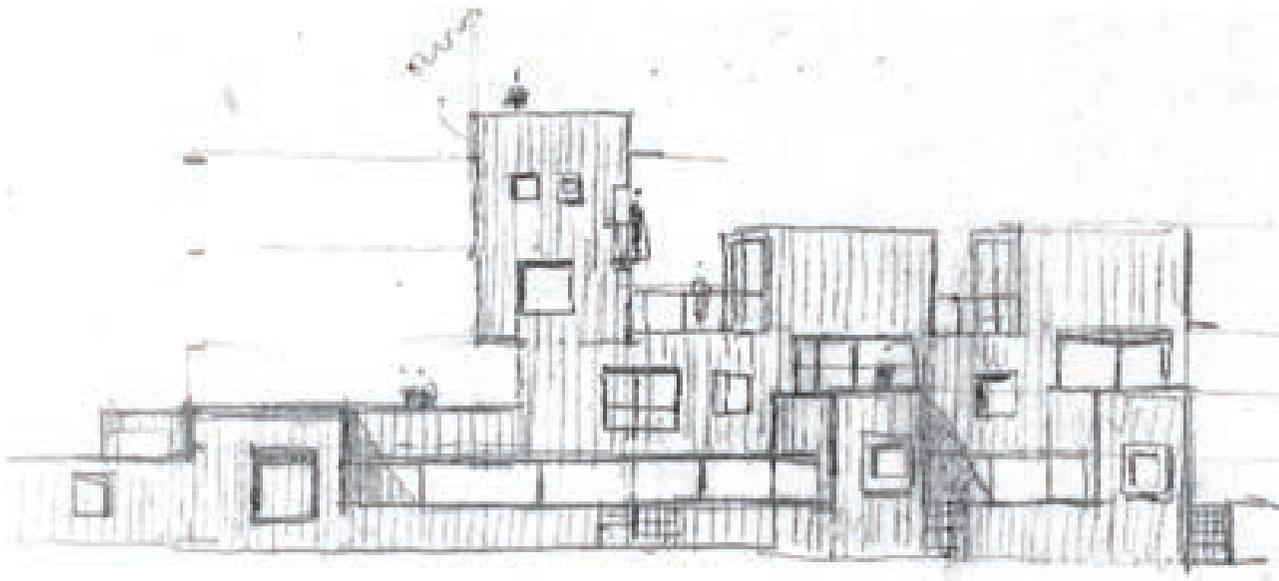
Hannibal Road Gardens: Sketch elevation.
